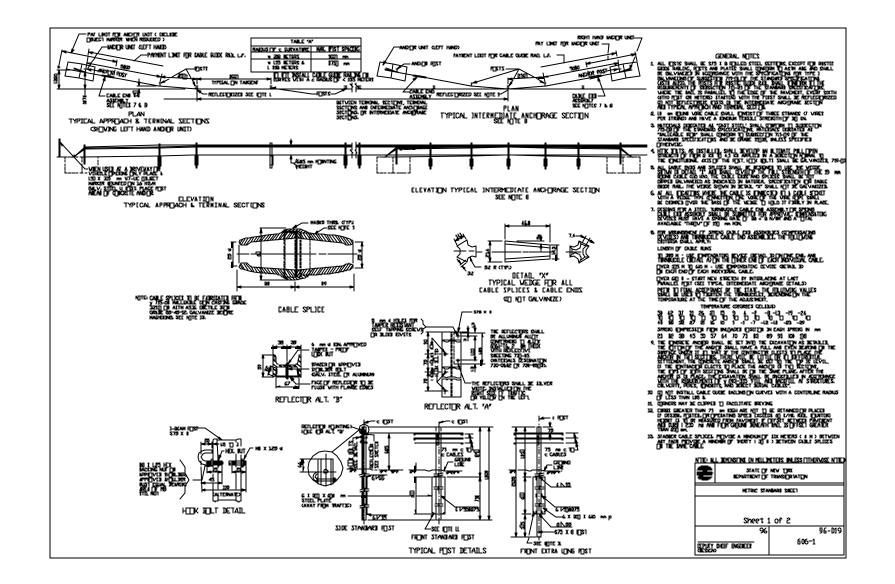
Details of the New York cable rail terminal installation for test 404211-6.
